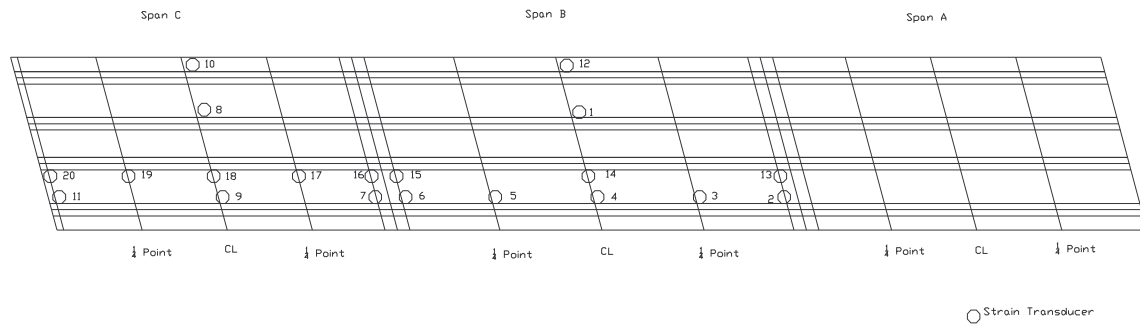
Bridge Instrumentation – Strain Transducer Location
